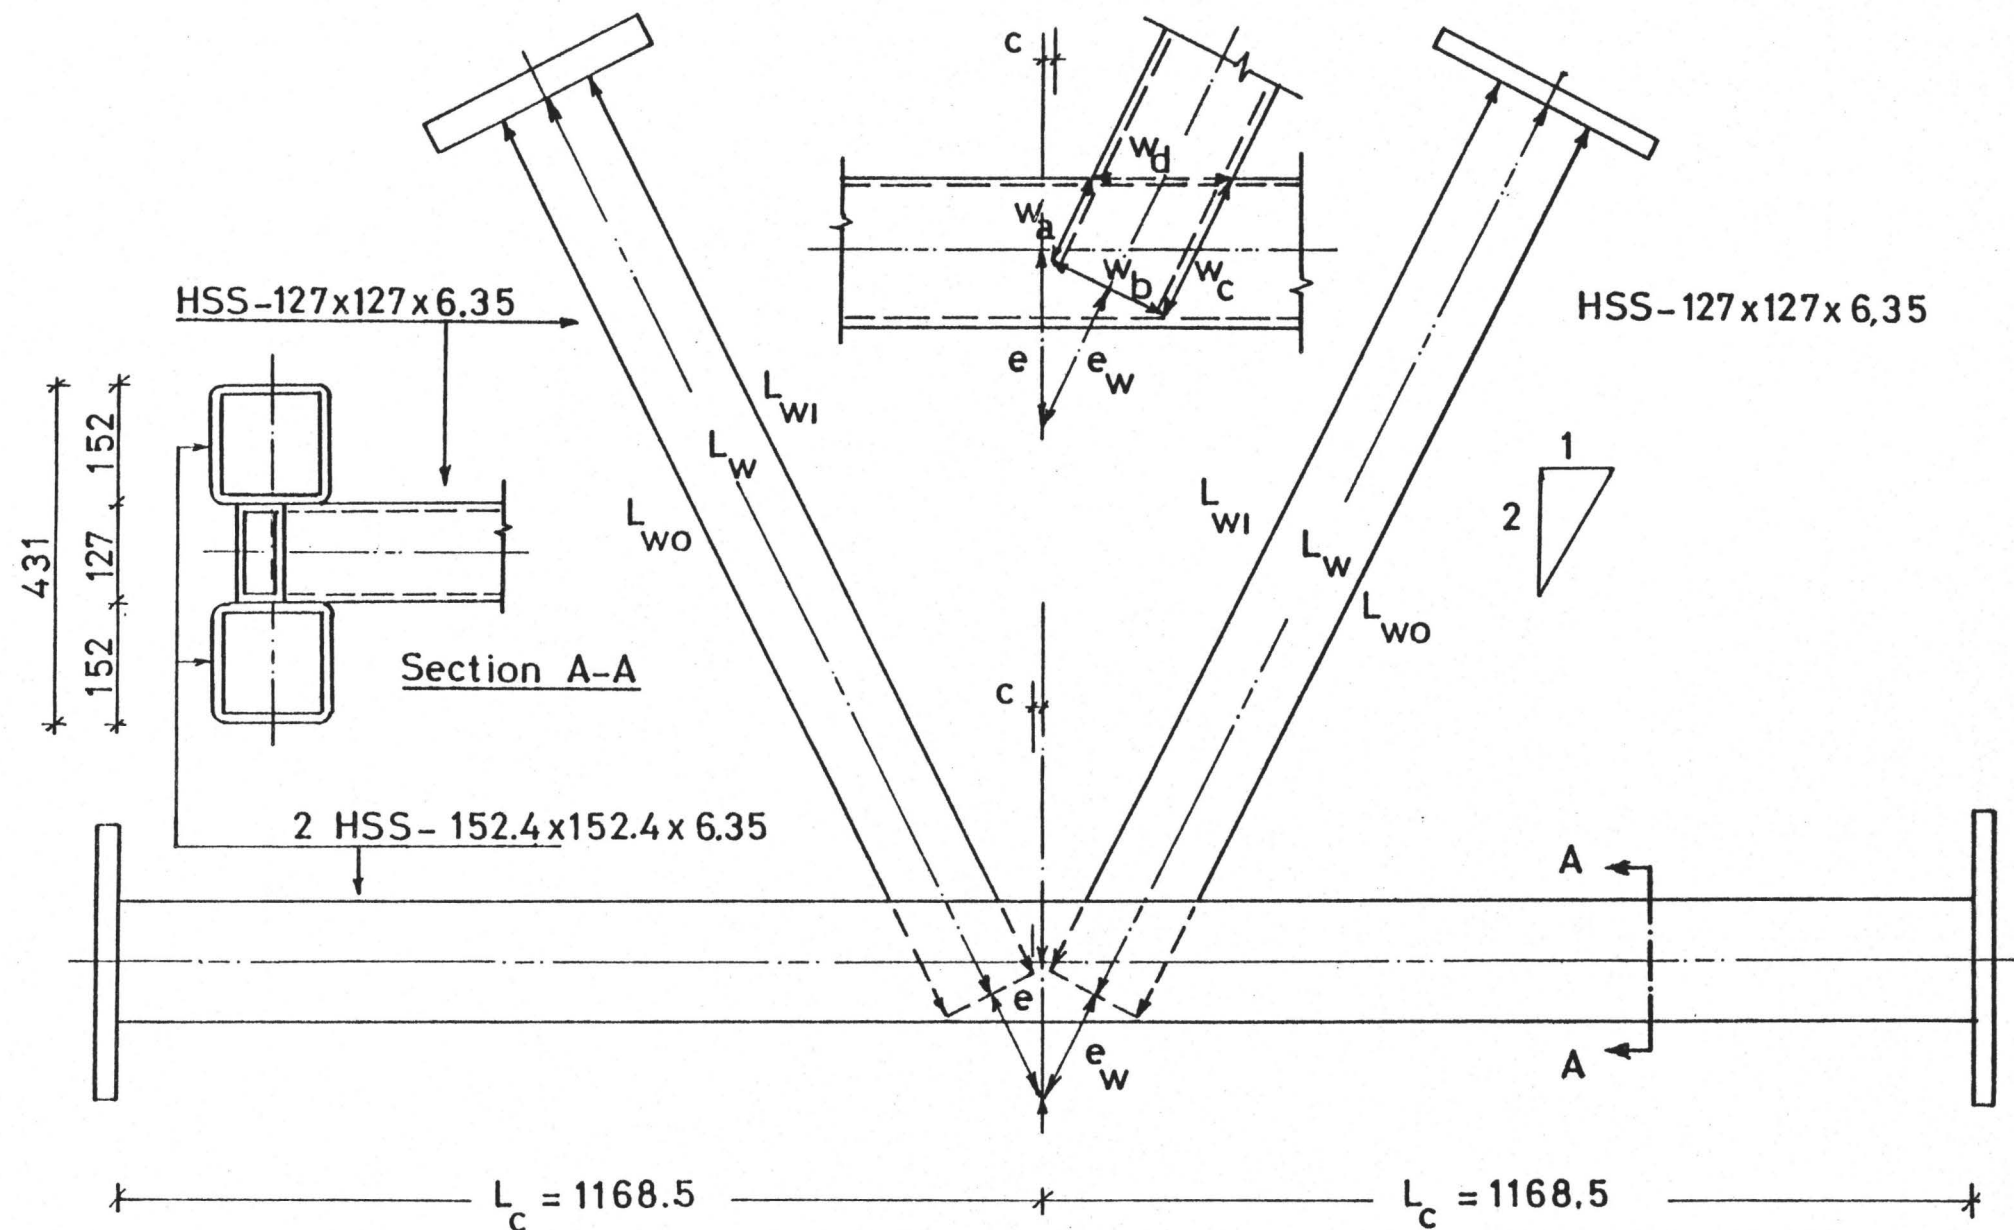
STANDARD TYPE JOINT (Dimension in mm)
